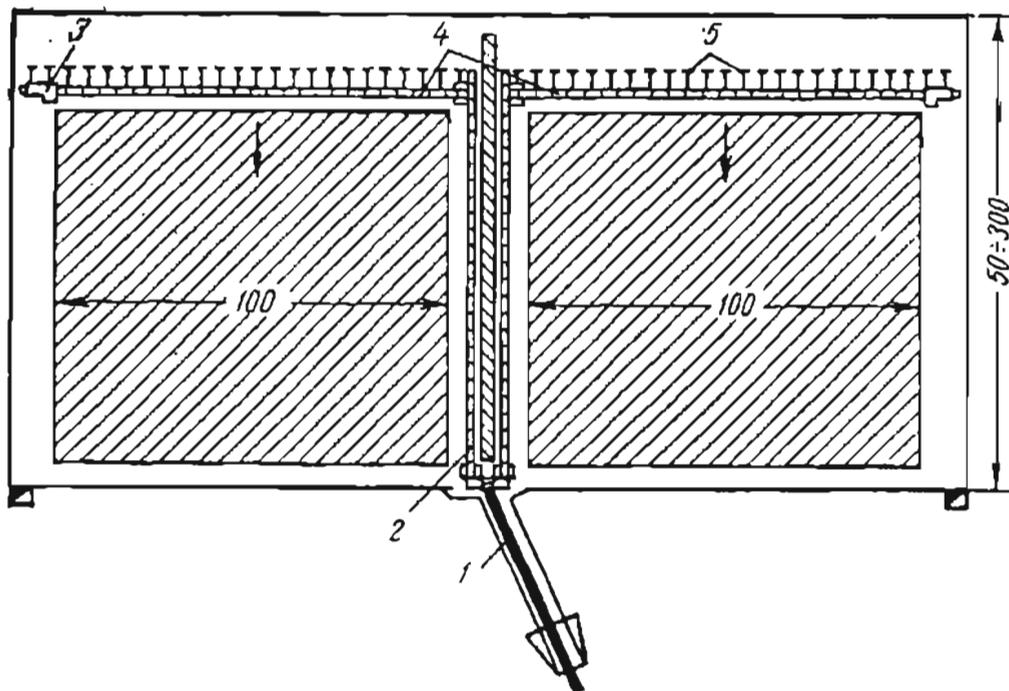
Development of a mine for a longwall system; 1 -belt conveyor KLSH-500; 2 chain conveyor SR-70A; 3 -shearer 2K-52; 4 -chain conveyor SP-63M; 5 -support 'Sputnik'; dimensions in m, (Emelanov et al, 1982)
